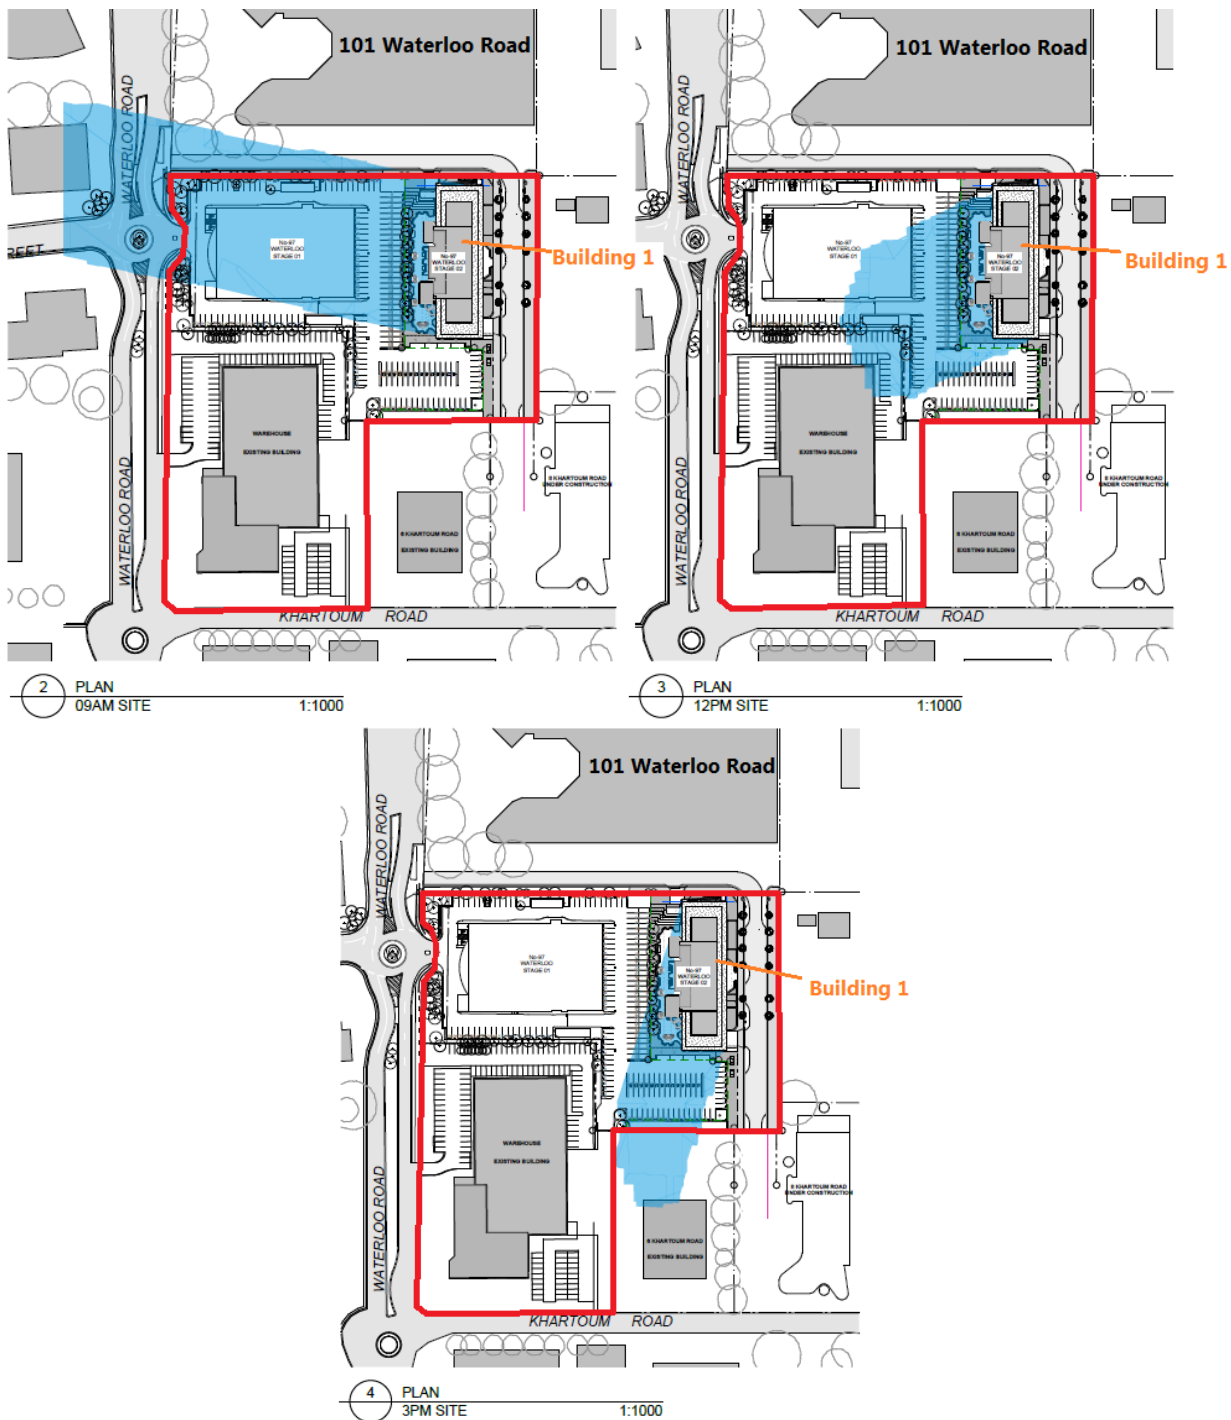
Shadow diagrams of Building 1 with Lot 2 development as existing (Dwg no. DA27, Issue C)
